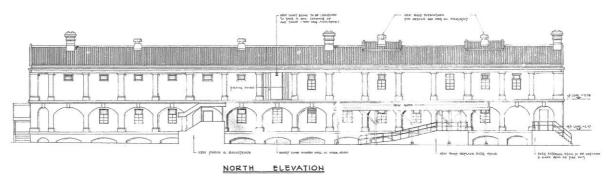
Proposed renovation on north façade, extracted from Architectural Proposed Plan for Kowloon Park, Drawing No. ASM/ 5704, dated 1986. (Source: Architectural Services Department)
